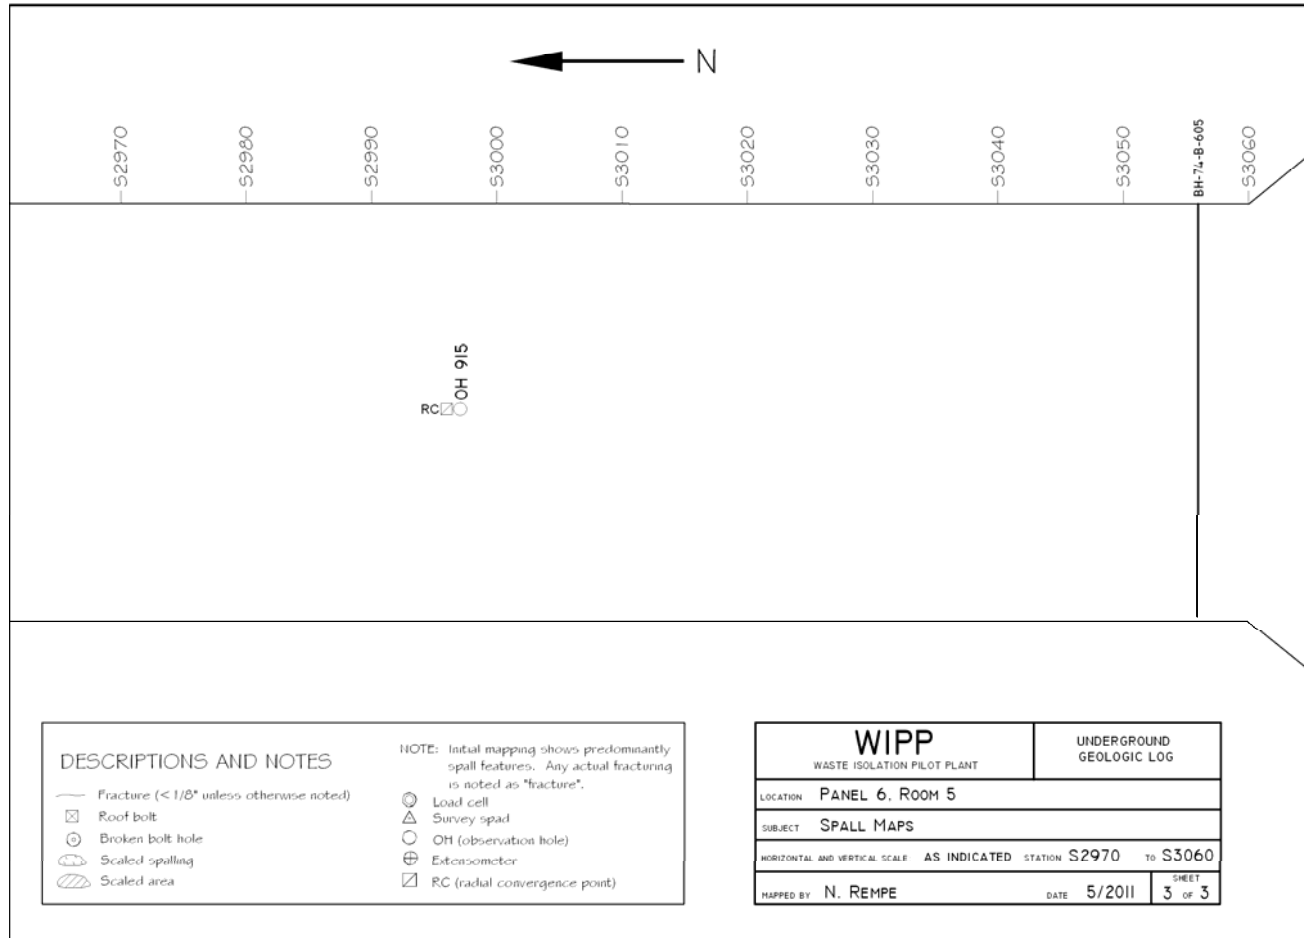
Panel 6 Room 5, S2770-S3060 Roof Fractures (Sheet 3 of 3)
